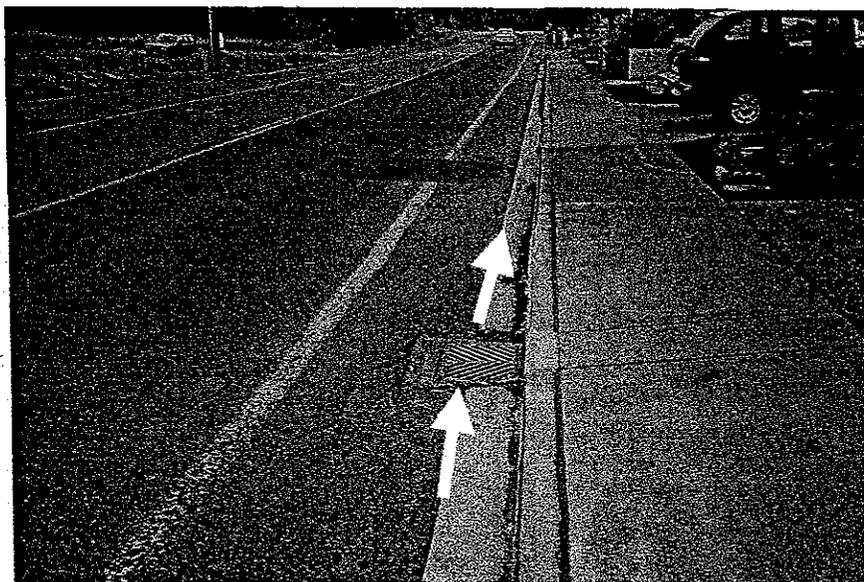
Downstream catch basin from photo 9 along Sultan Basin Road conveying runoff south.
